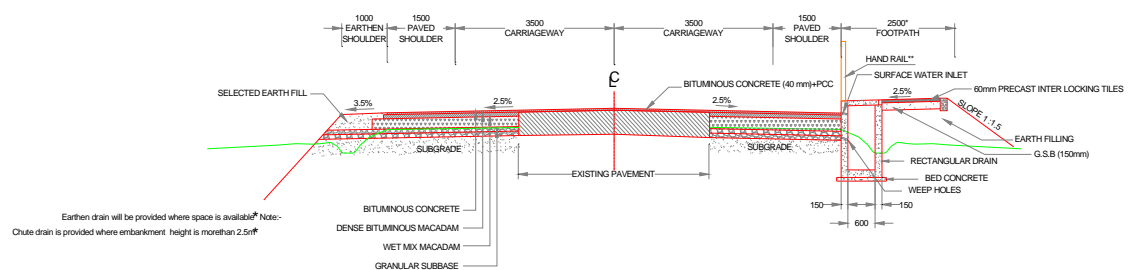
TYPICAL CROSS SECTION- TYPE-5
